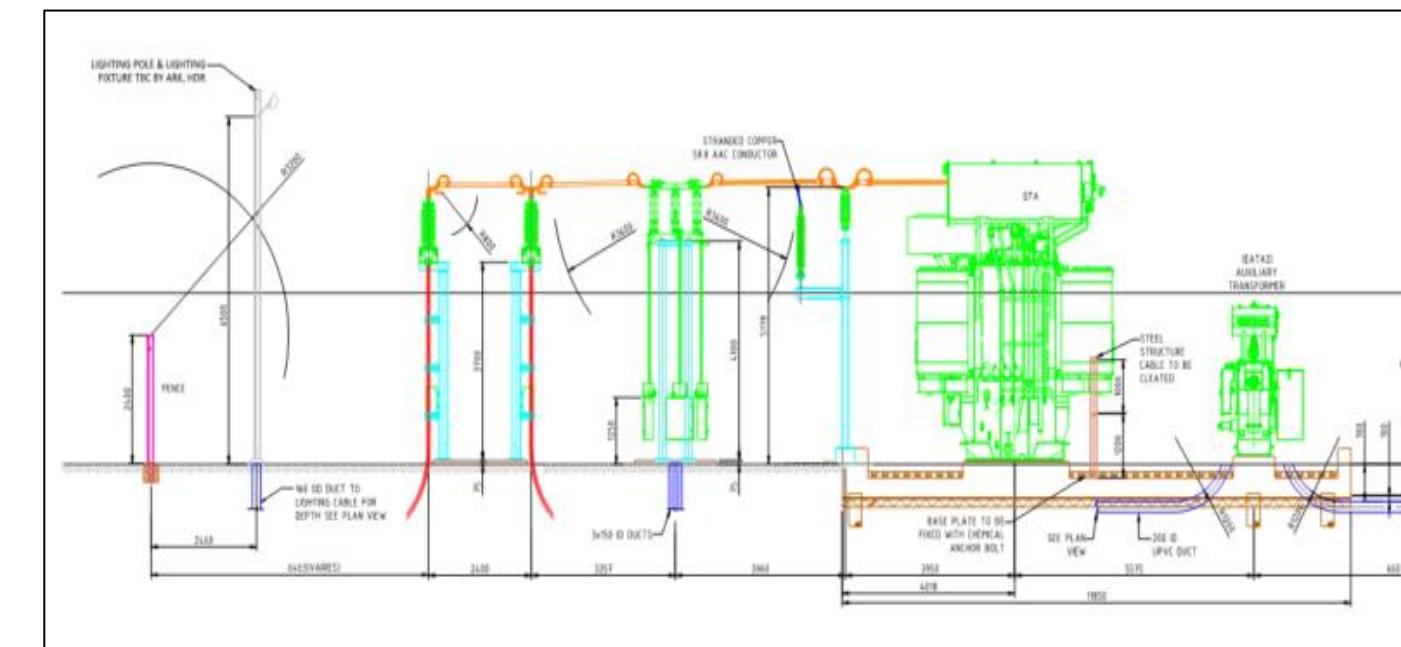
Outline drawing of transformer and Auxiliary Transformer
